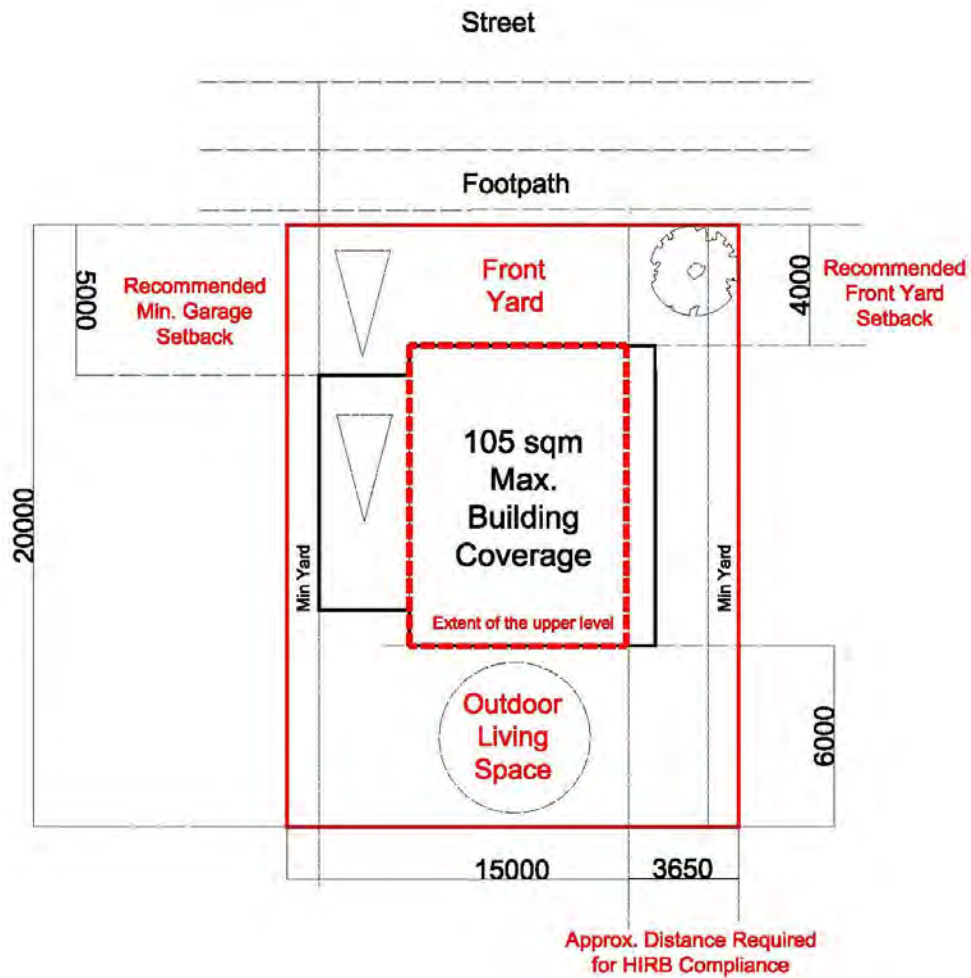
Site Layout Testing Diagram 3. 15mX20m site option. Testing for a two-storey development with a single garage and additional car pad. Recommended front yard and garage setback controls implemented. Single House HIRB was used. 15m wide site would allow a storey development option with the Single House HIRB, 2.5m and 45 degrees while maintaining a level of structural integrity between levels. A building width of approximately 7.2m to 7.7m could be achieved on the upper level.
